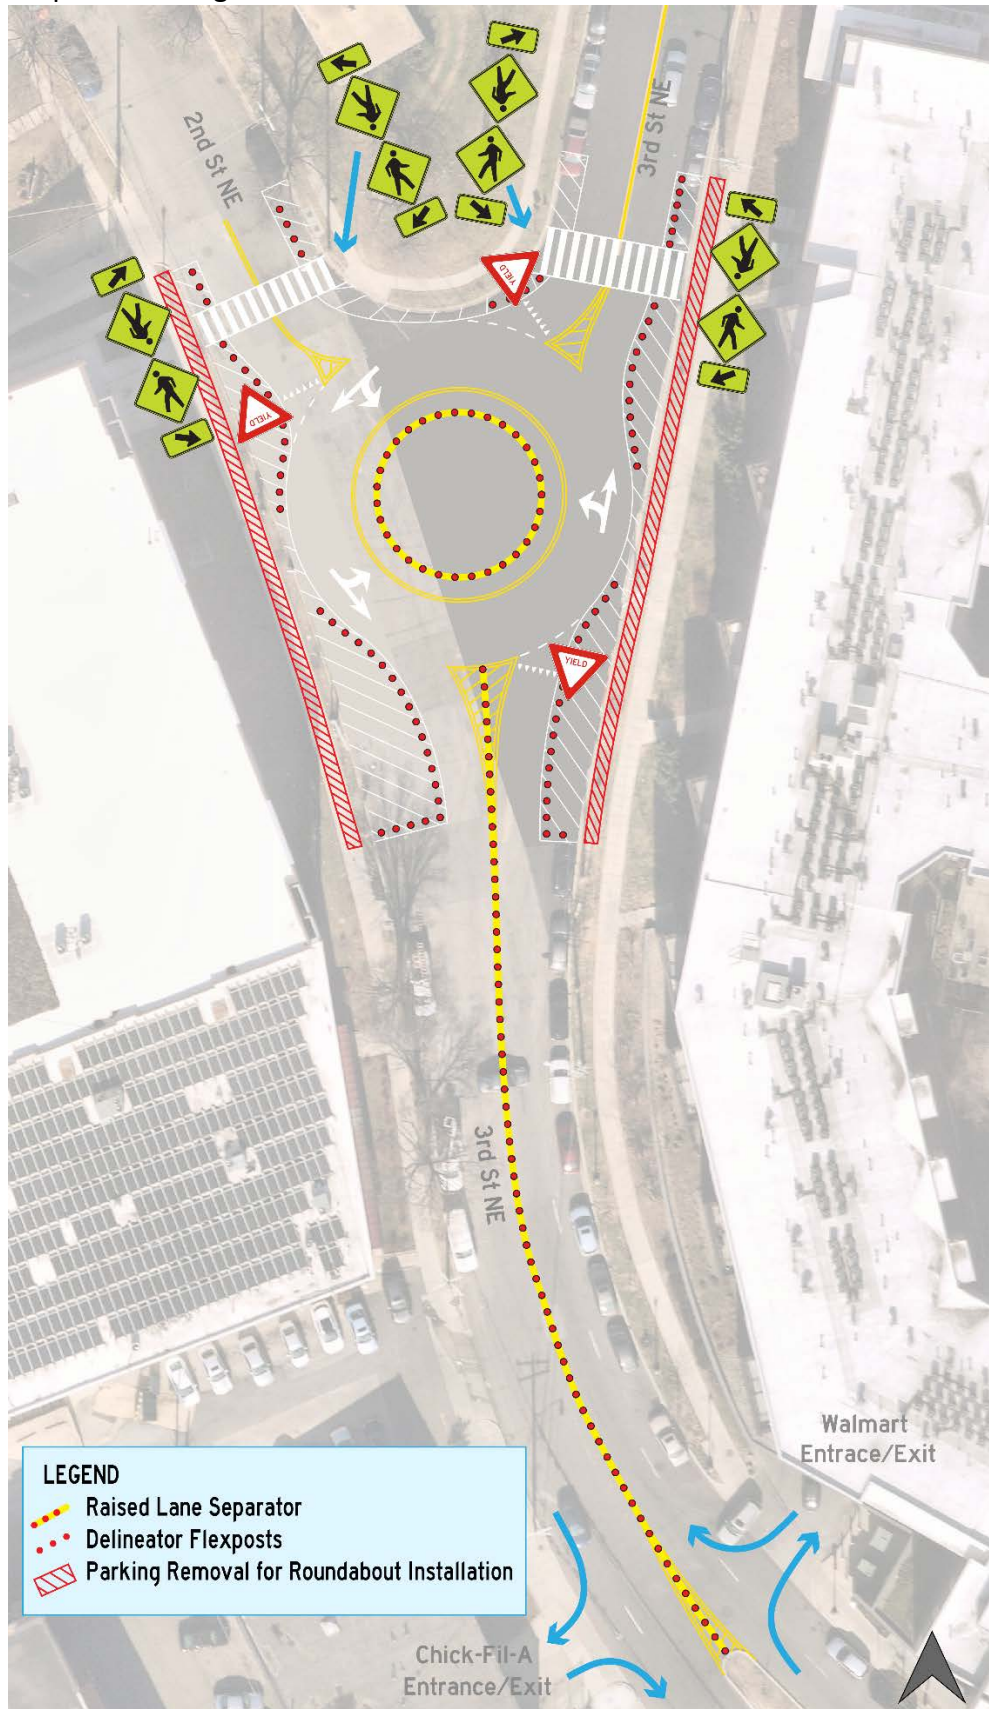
Proposed Configuration at the Second and Third Street NE Intersection
